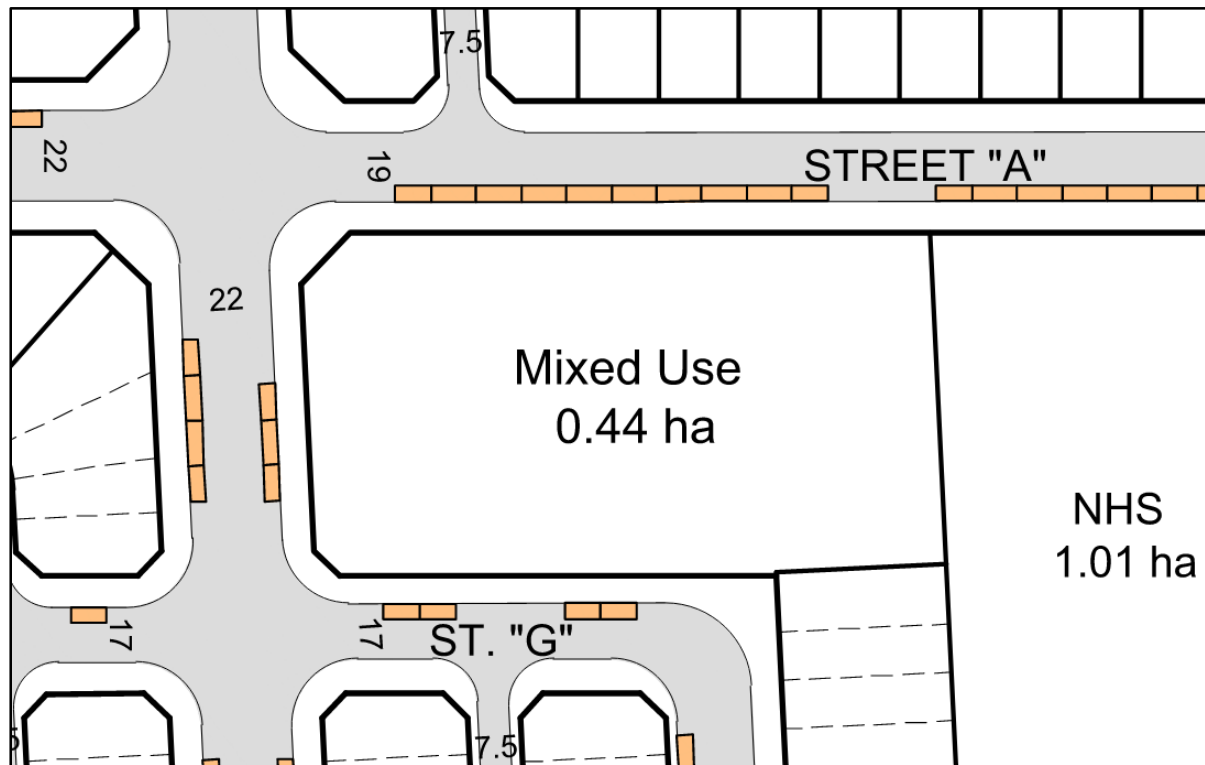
On-street parking plan (Argo Joshua Creek (24T-20002/1308) Plan of Subdivision extract)
